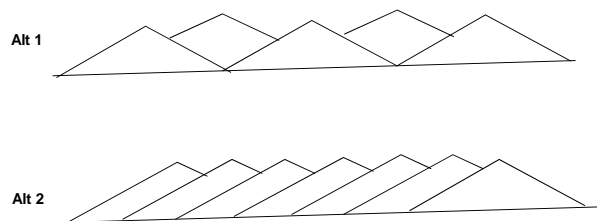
shows a plan and section of a typical advancing cone. Figure 2 shows a typical method of pipeline advancement and Figure 3 shows alternative methods of developing adjacent advancing cones.
